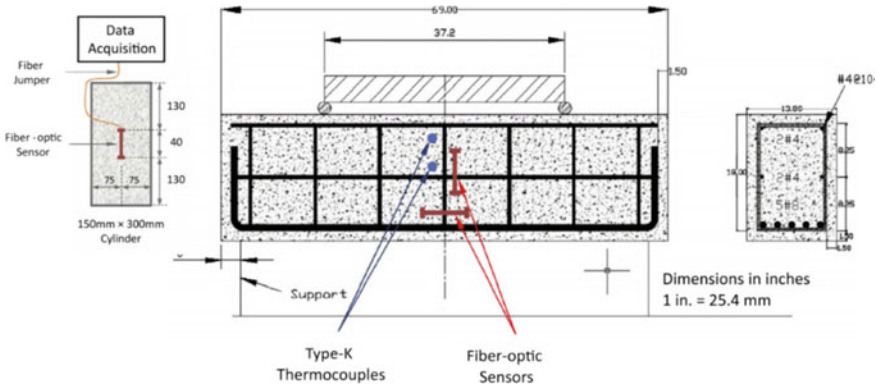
Experimental setup: cylinder testing and beam testing (Yehia et al. 2014)
